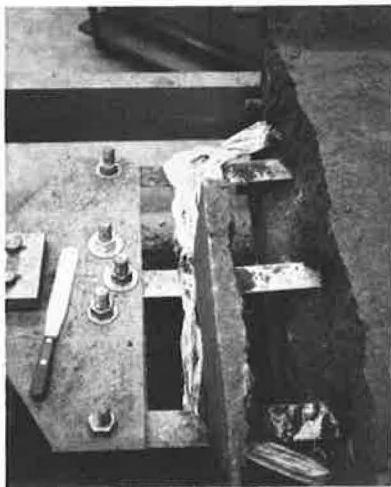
Cone-shaped failure in specimen with solid steel-plate reinforcement for test 7.
